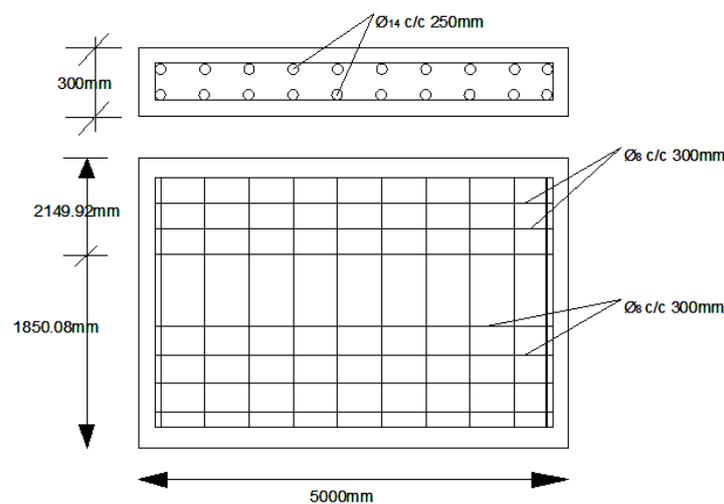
Reinforcement detailing of the reinforced concrete shear wall
